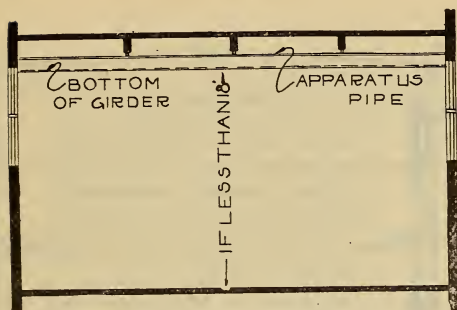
Typical Apparatus Pipe Frame as applied to a Gymnasium in which the ceiling girders exceed the allowable maximum height for suspended apparatus.
